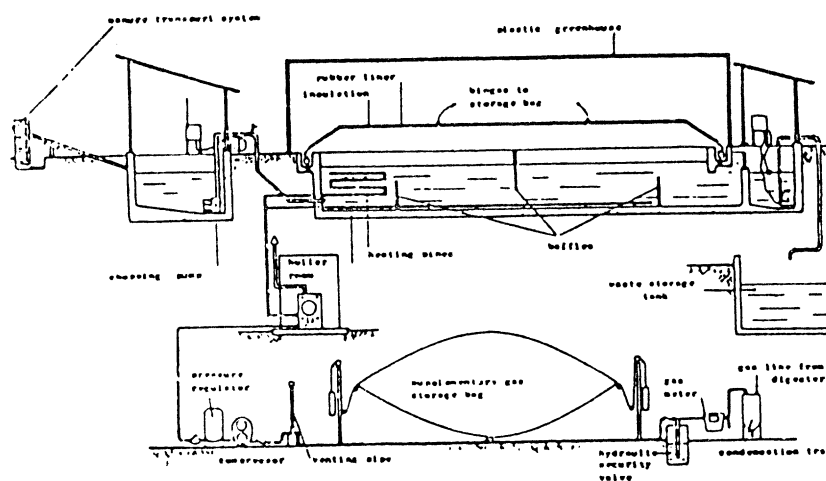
Figure XIII. Tunnel-type digester with flexible roof (Italy)
